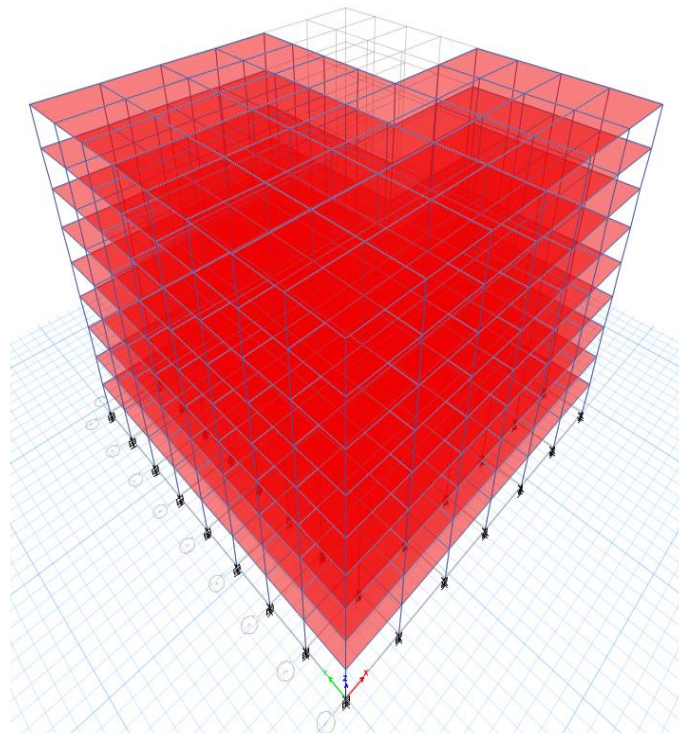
Three Dimensional view of G+8 RCC Frame Building Using FREI
